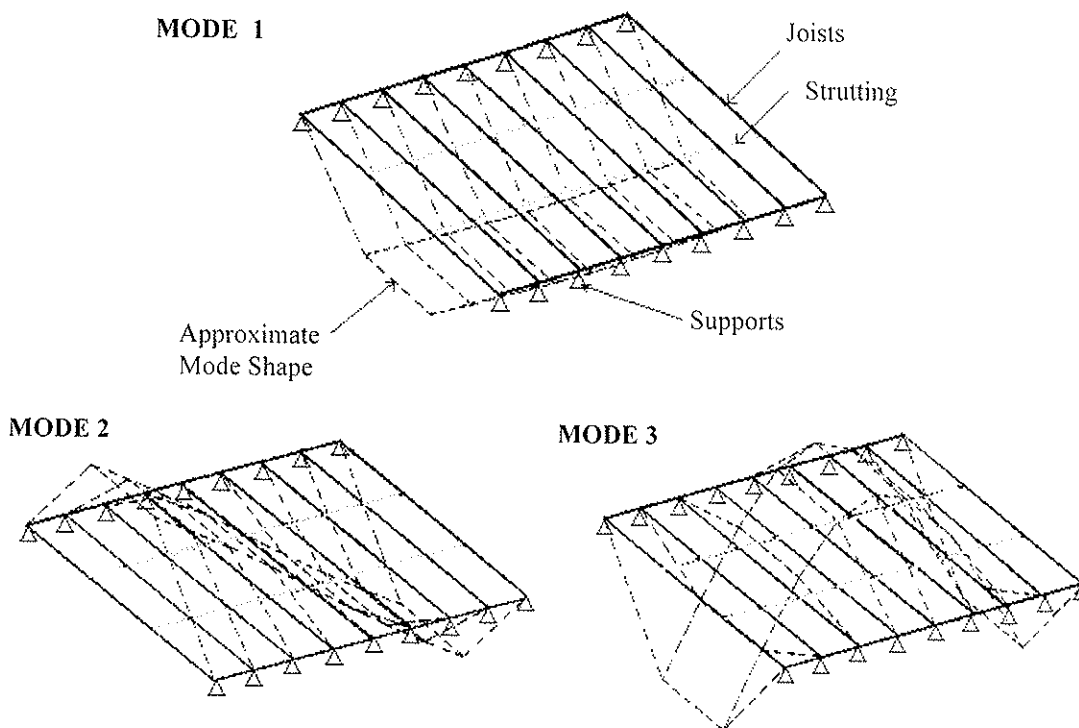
Example Mode Shapes (1-3) for a One Way Spanning Timber Floor Structure (Not to Scale).
